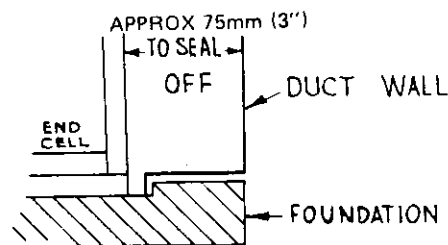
Fitting of Duct Wall to Base to Prevent Spillover of Water.
